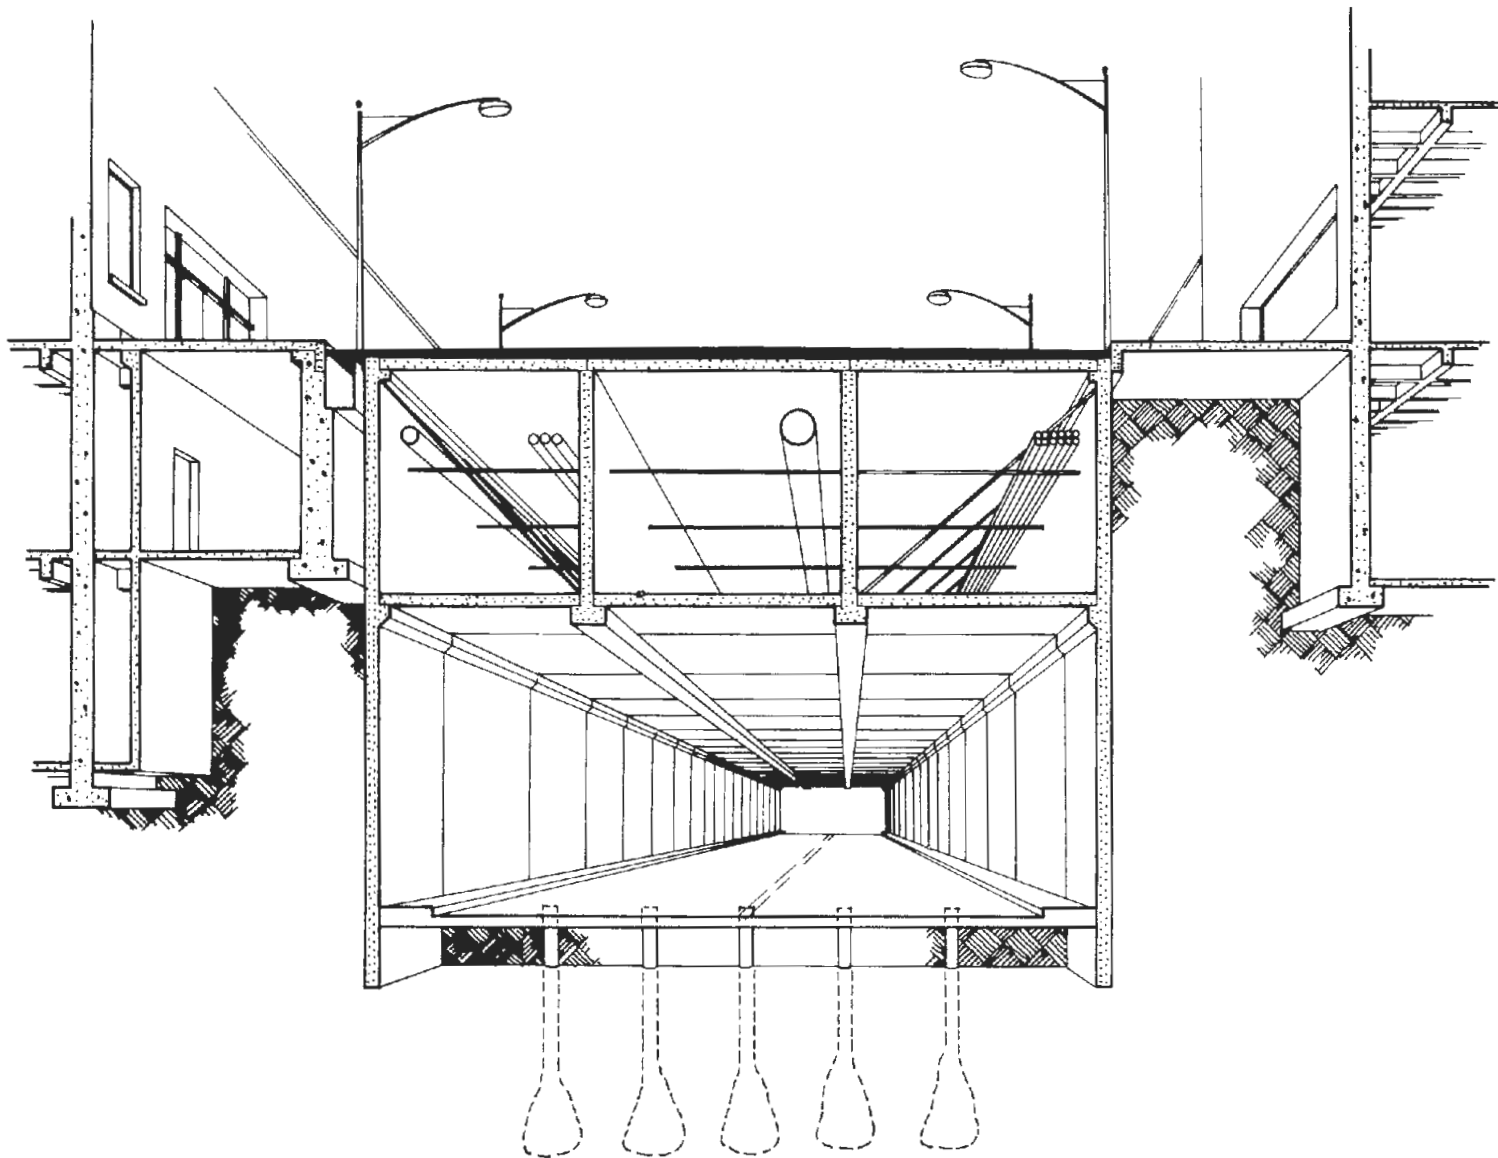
Two structural levels tied together to act as a modified Vierendeel truss.
